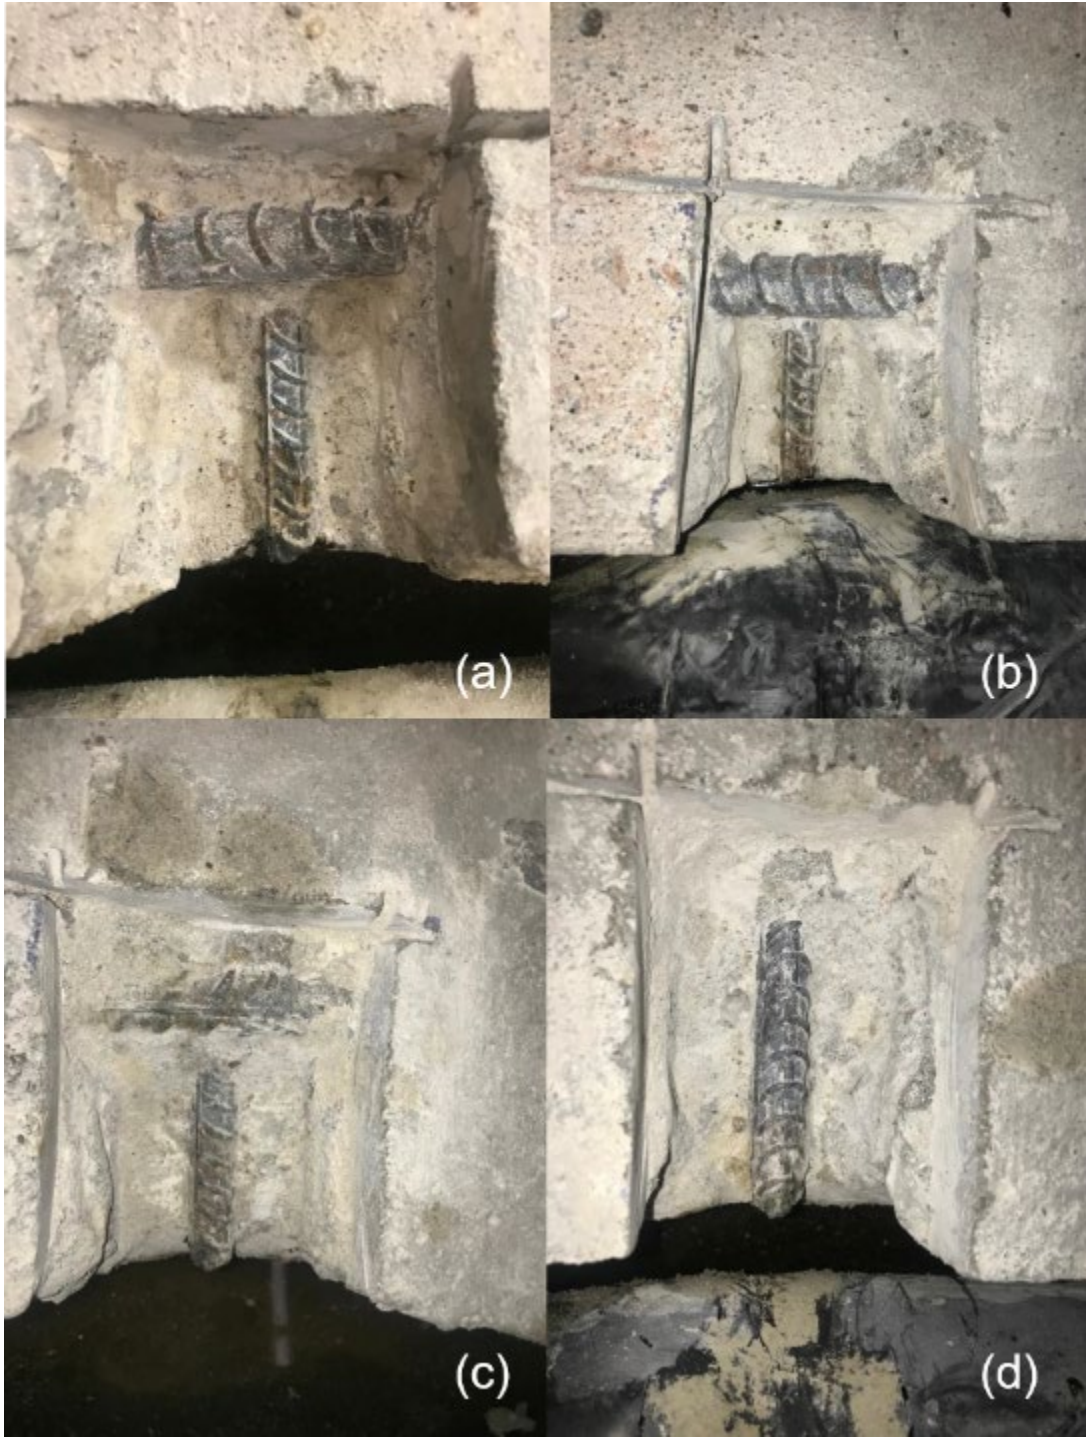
Second rebar excavation for large-scale corrosion specimens using (a) ODOT AA, (b) J3, (c) Ductal®, and (d) Phoscrete
